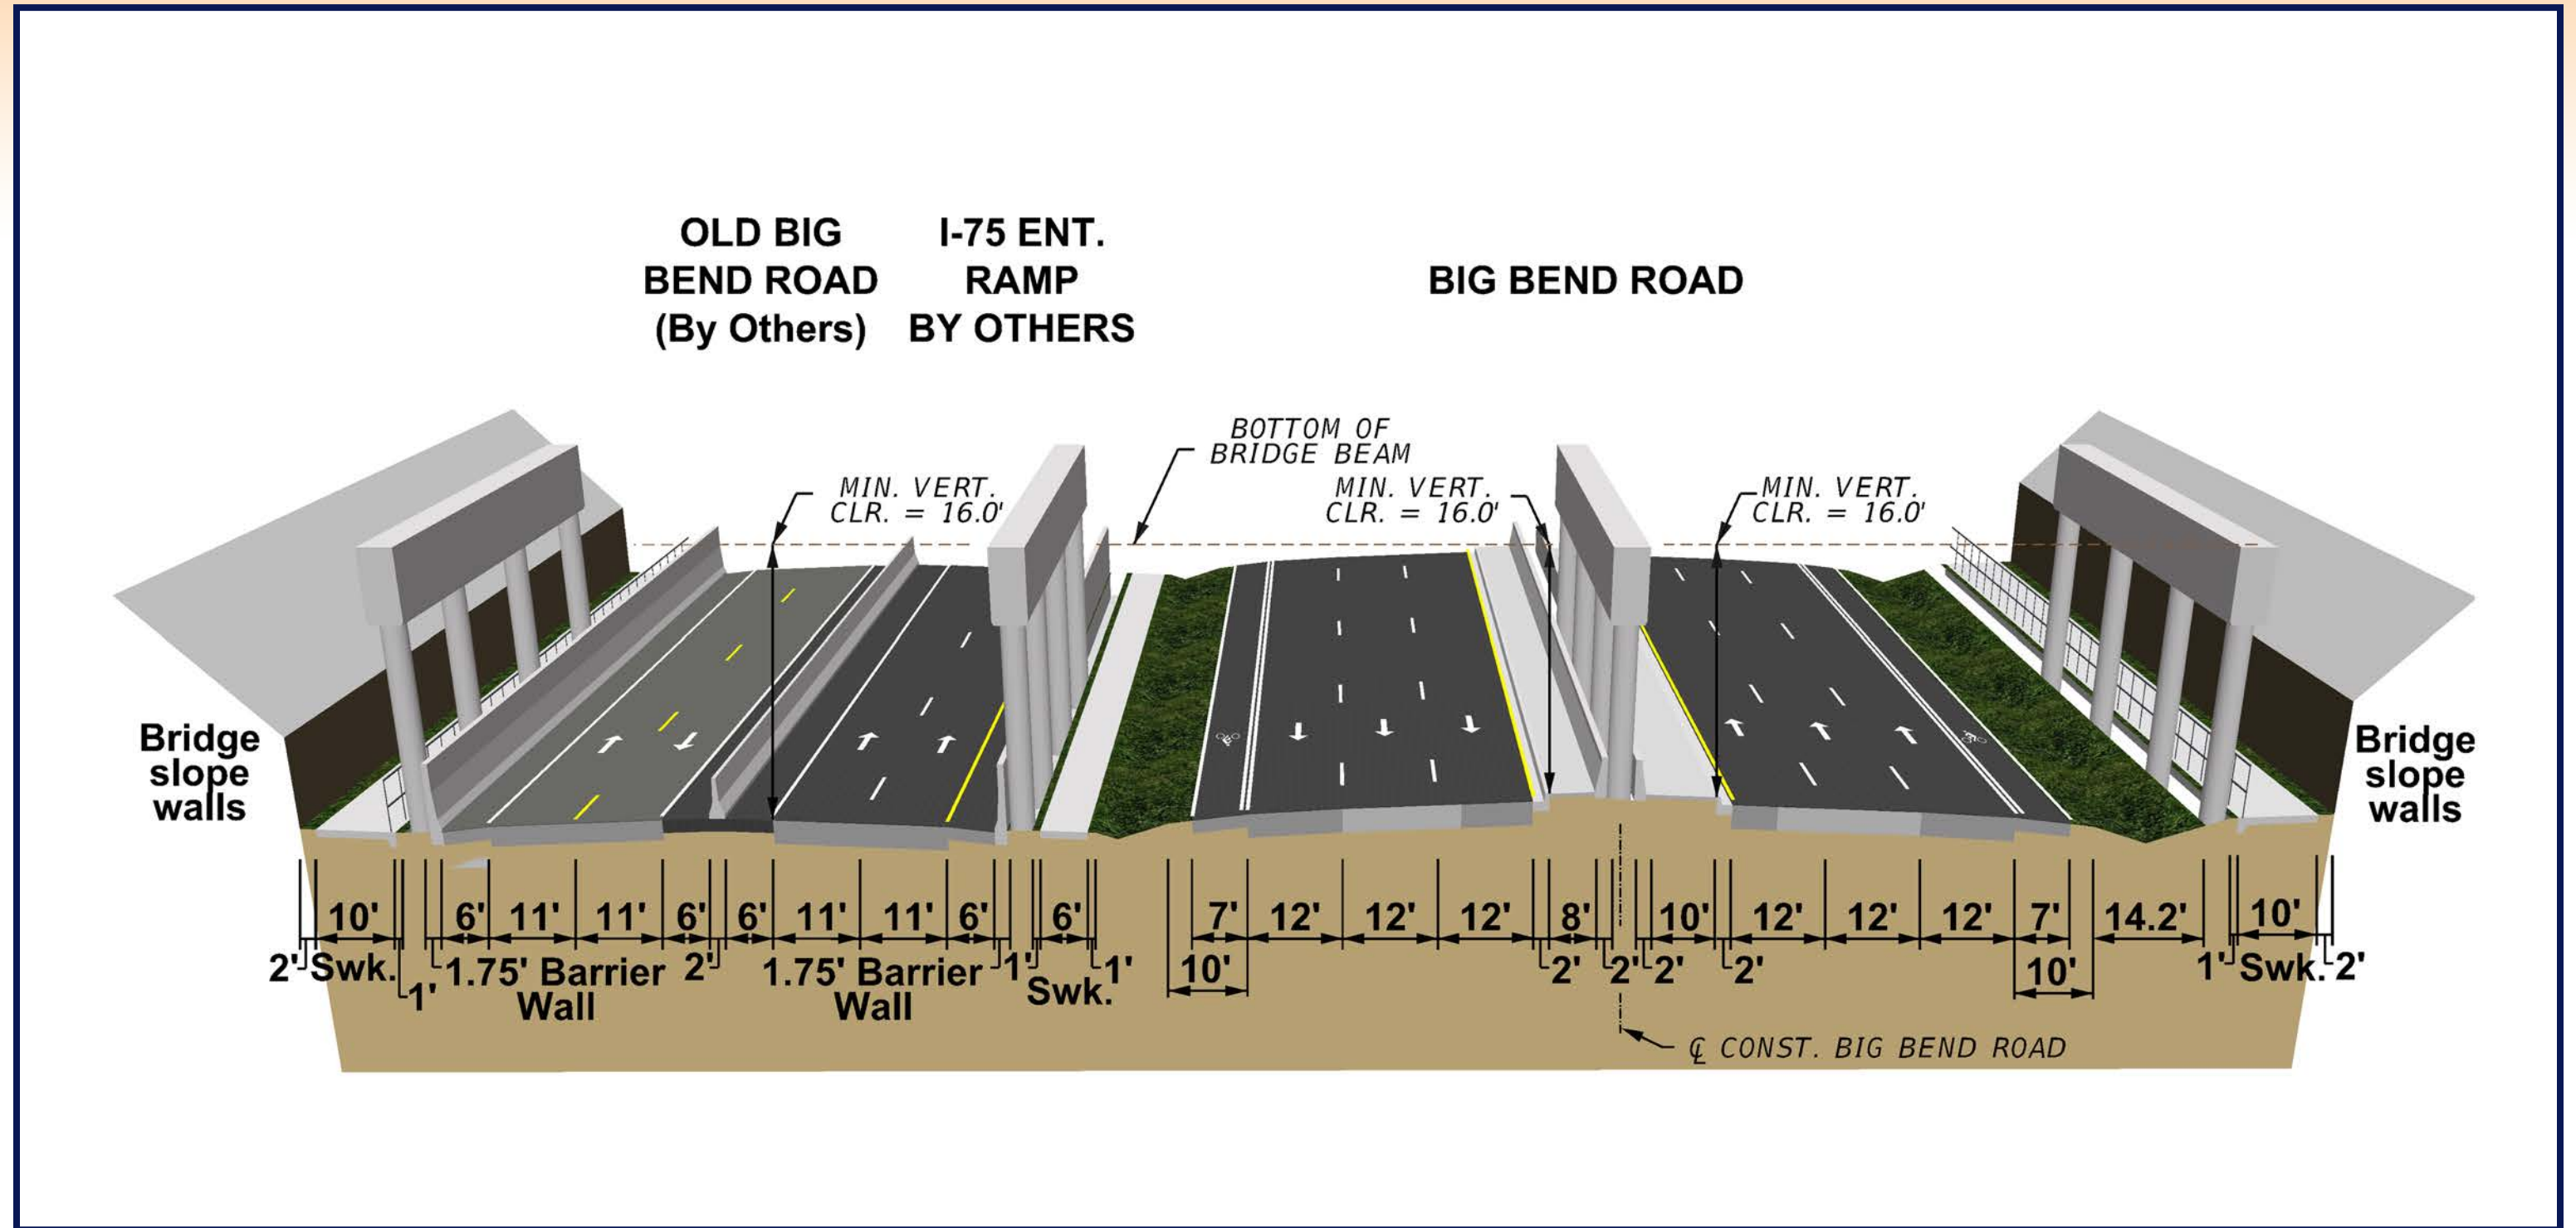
Proposed Typical Section – Big Bend Road: At I-75 (SR 93A) Overpass
